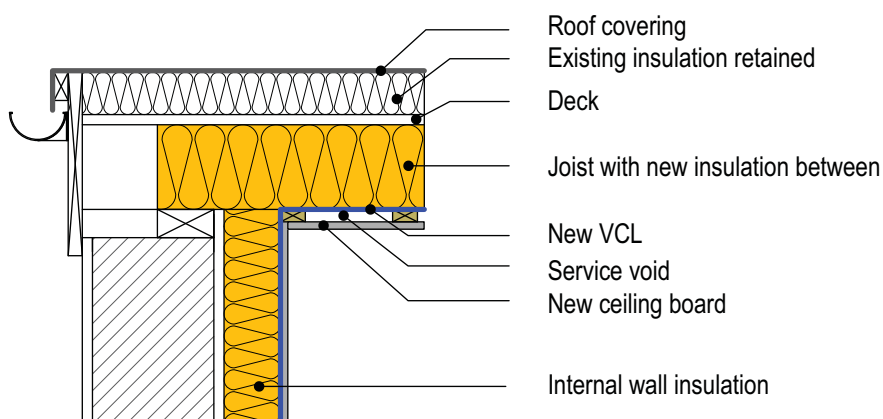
Warm roof improved with insulation below, plus internal wall insulation
